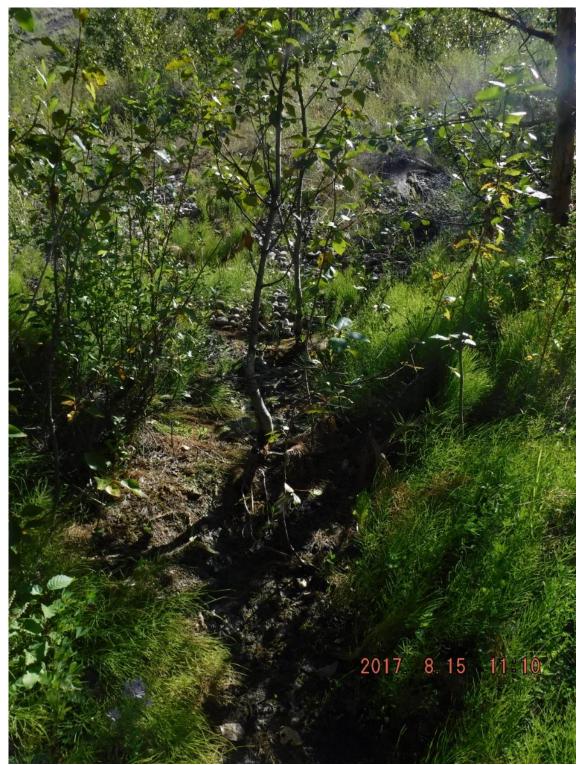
Typical finger drain wrapped with geotextile – wet ground downstream of the drain outlet noted (<1 L/min flow) (PTD-2017-21)
